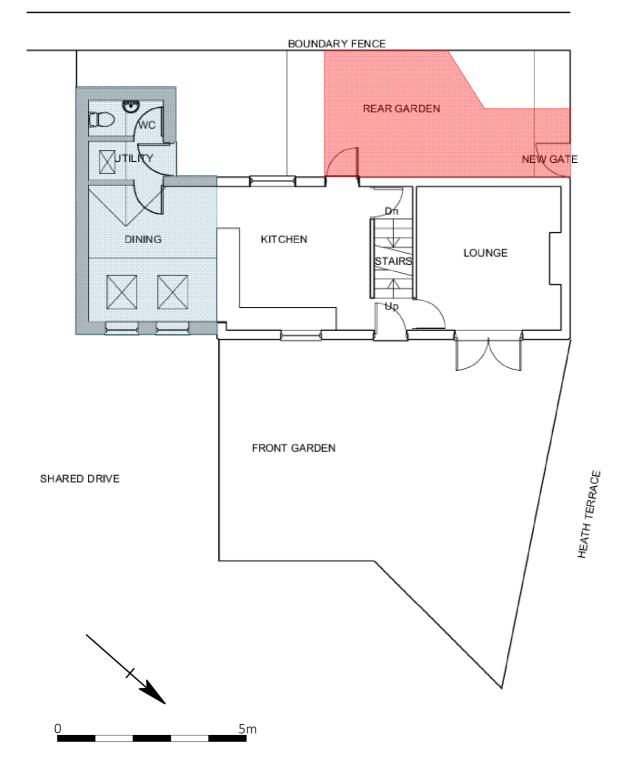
Development plan; the area that required monitoring is highlighted in red (scale 1:100)
